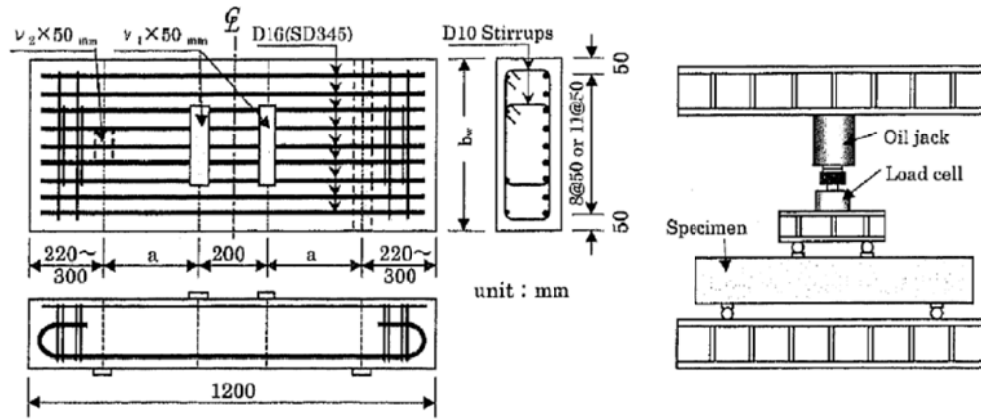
Specimen and loading system, Furuuchi et al. (1998).
